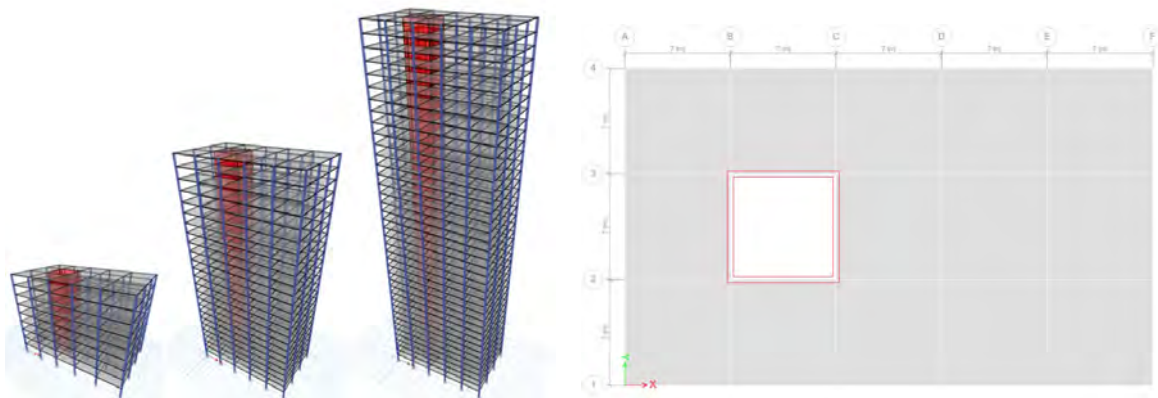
Nine, twenty-five and forty storey buildings' 3D and plan views
